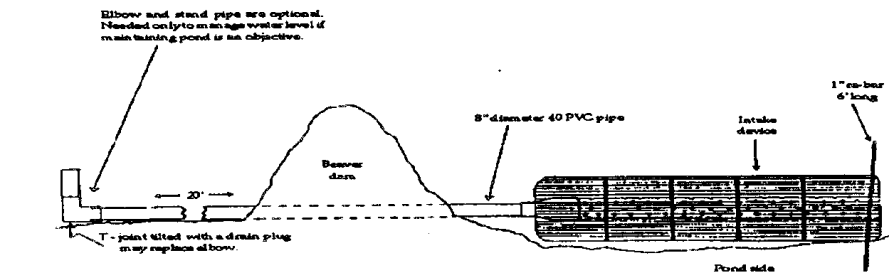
Clemson beaver pond leveler used to control water level and prevent flooding from beaver damming activity.
